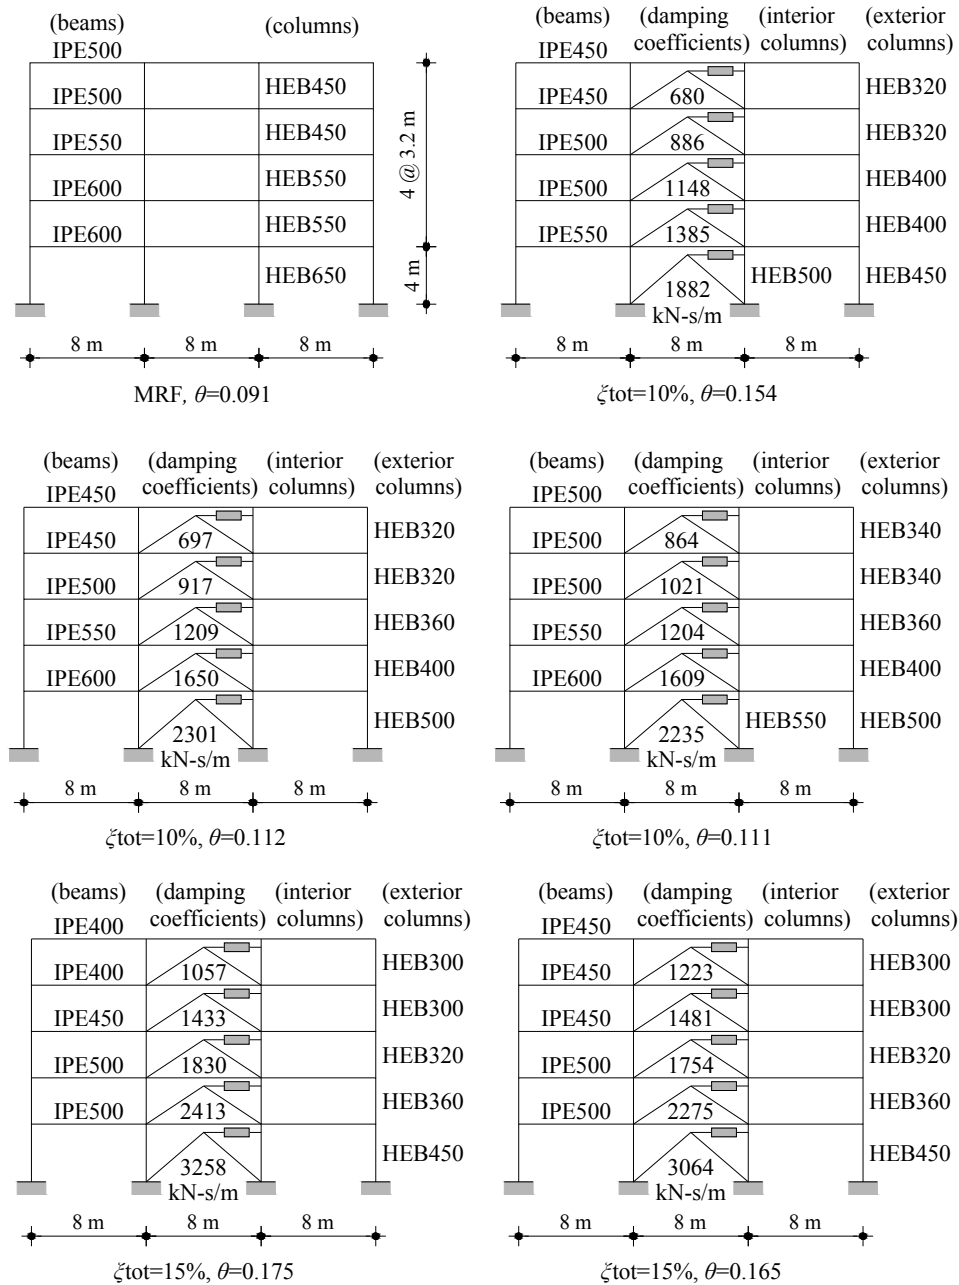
Elevation view and beam/column cross-sections of the 5-storey steel MRF and the MRFS with viscous dampers. The damping coefficients of the viscous dampers are also provided. The interior column cross-sections of the MRFS with viscous dampers are the same with the exterior apart from the indicated
